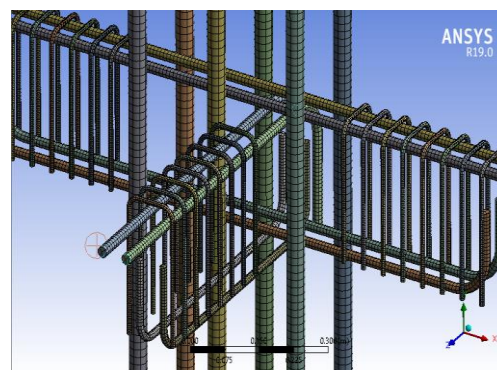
Connections on contact surfaces of concrete and reinforcement
